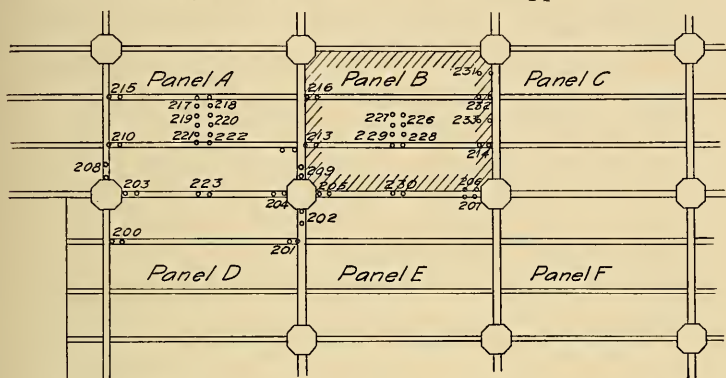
PLAN SHOWING LOCATION OF GAUGE LINES ON UPPER SIDE OF FLOOR.
